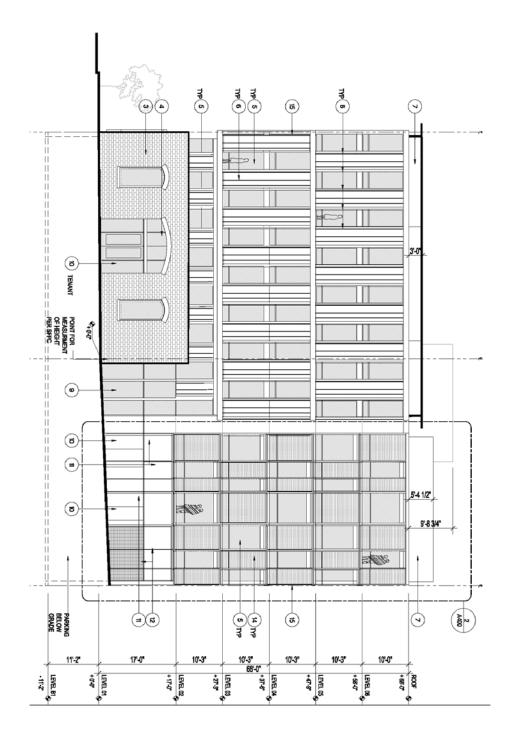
PROPOSED SOUTH ELEVATION (19TH STREET)
